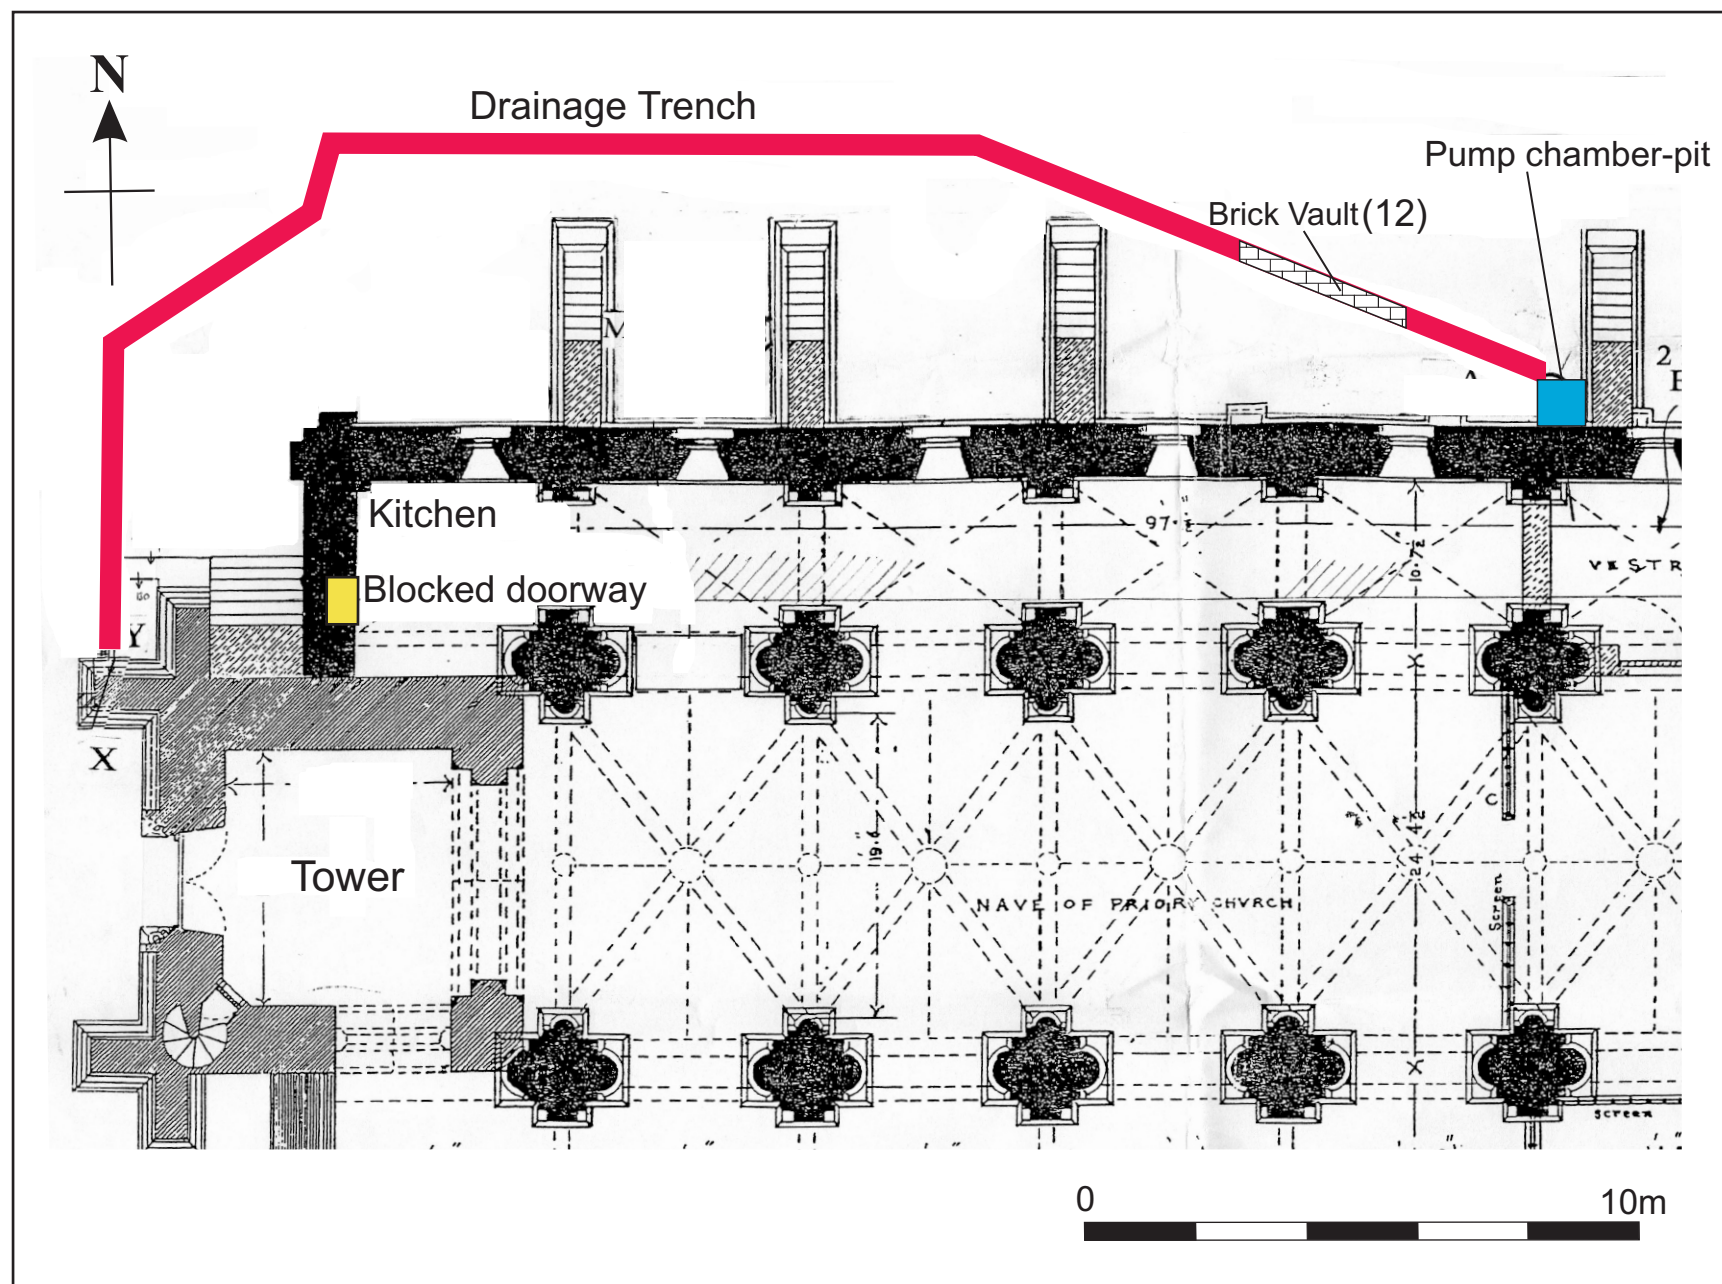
Location of drainage trench, pump chamber pit and blocked doorway (after Frith Moxon Ltd.)
